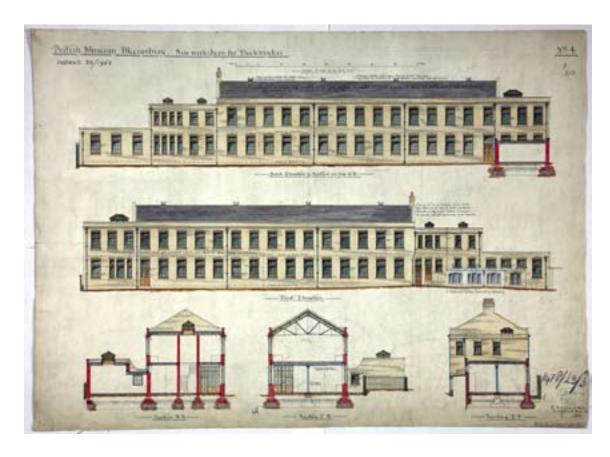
British Museum, Bloomsbury, New workshops for Bookbinders, 1898, elevations and sections. Copyright TNA (WORK 33/1963)
